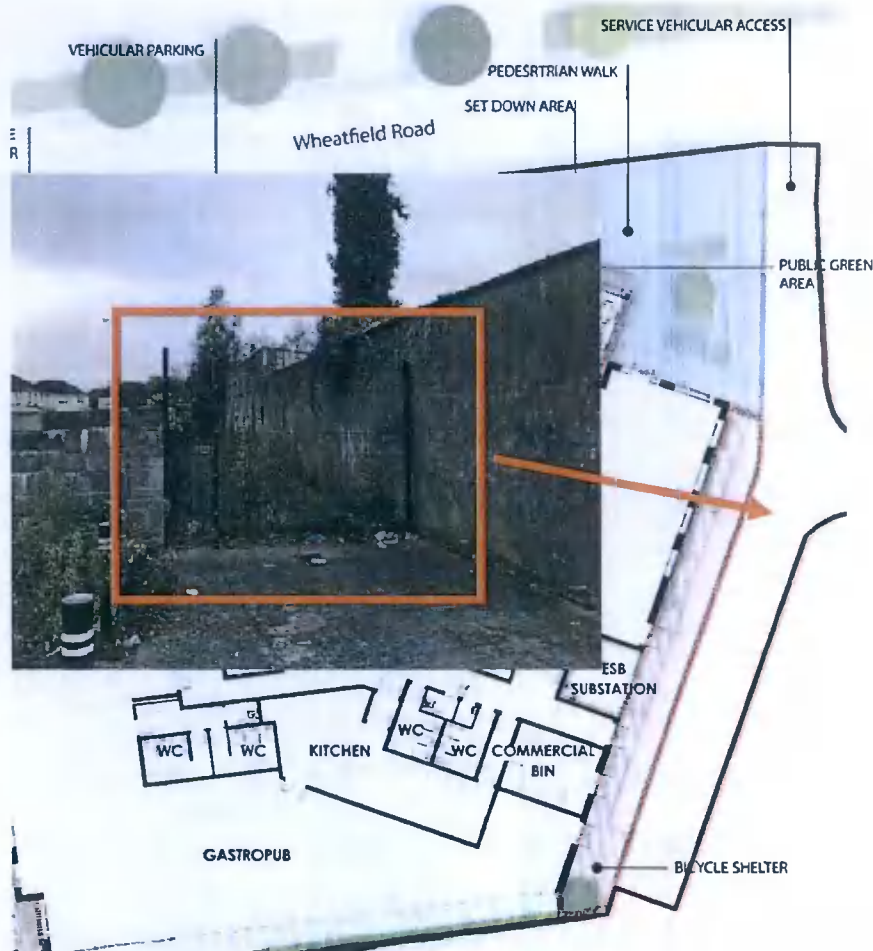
Existing laneway closed off to the east of the Applicant site (Photo BPS, October, 2021)
